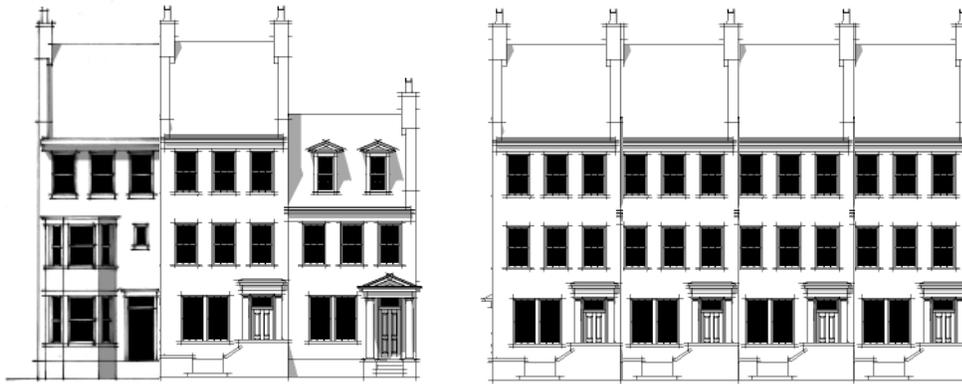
Permitted block face elevation in cases where repeated elevations are used and composed as separate units
